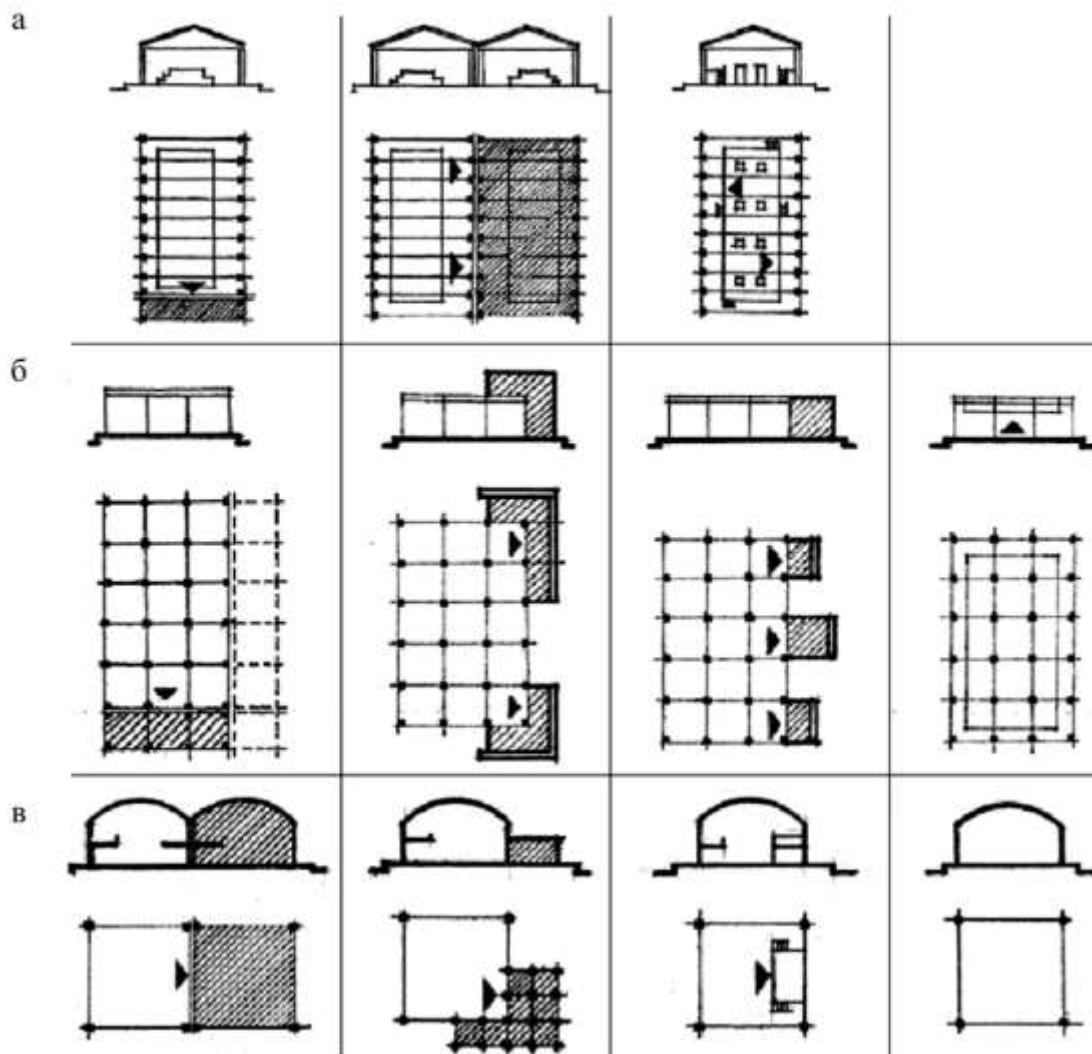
Methods of expanding production areas during the reconstruction of industrial buildings of various types: a - span buildings; b - cellular buildings; c - hall buildings
